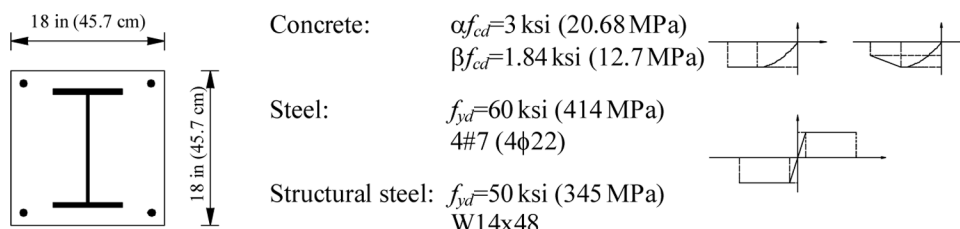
Reinforced concrete square cross section with embedded W14 x 48 section.
